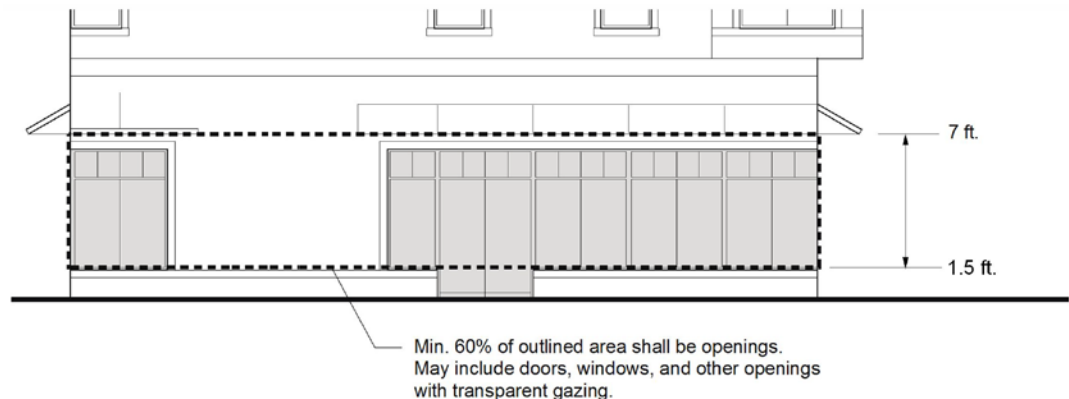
C-2-B: GROUND FLOOR COMMERCIAL TRANSPARENCY
